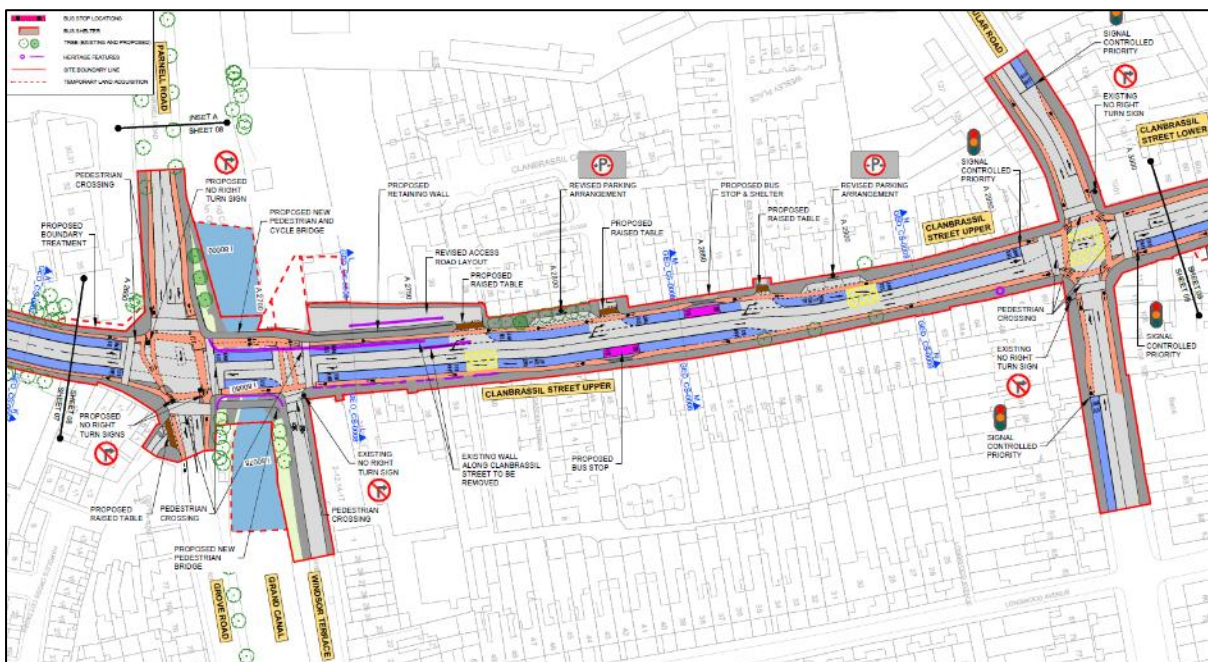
Extract from General Arrangement Drawings (Sheet 8)
